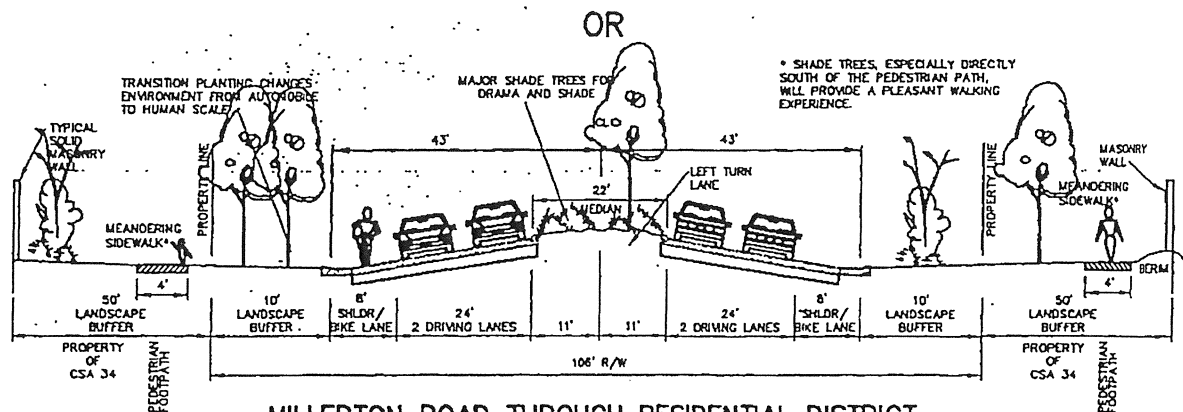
ROAD STANDARDS FOR MILLERTON ROAD
